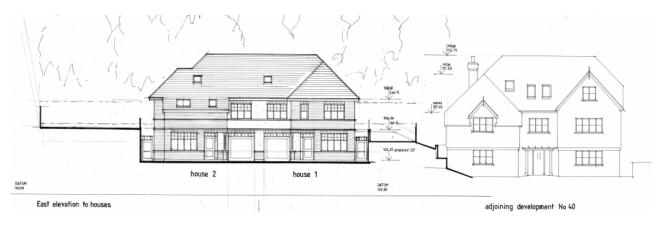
Proposed Front Elevation (rear semi-detached houses) in context
